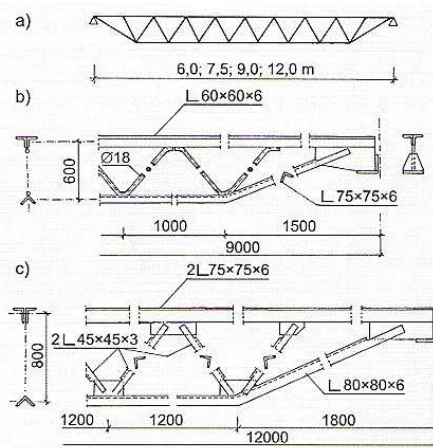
Typical lightweight truss purlin: a) geometry, b) purlin 9m spanned, c) purlin 12m spanned
